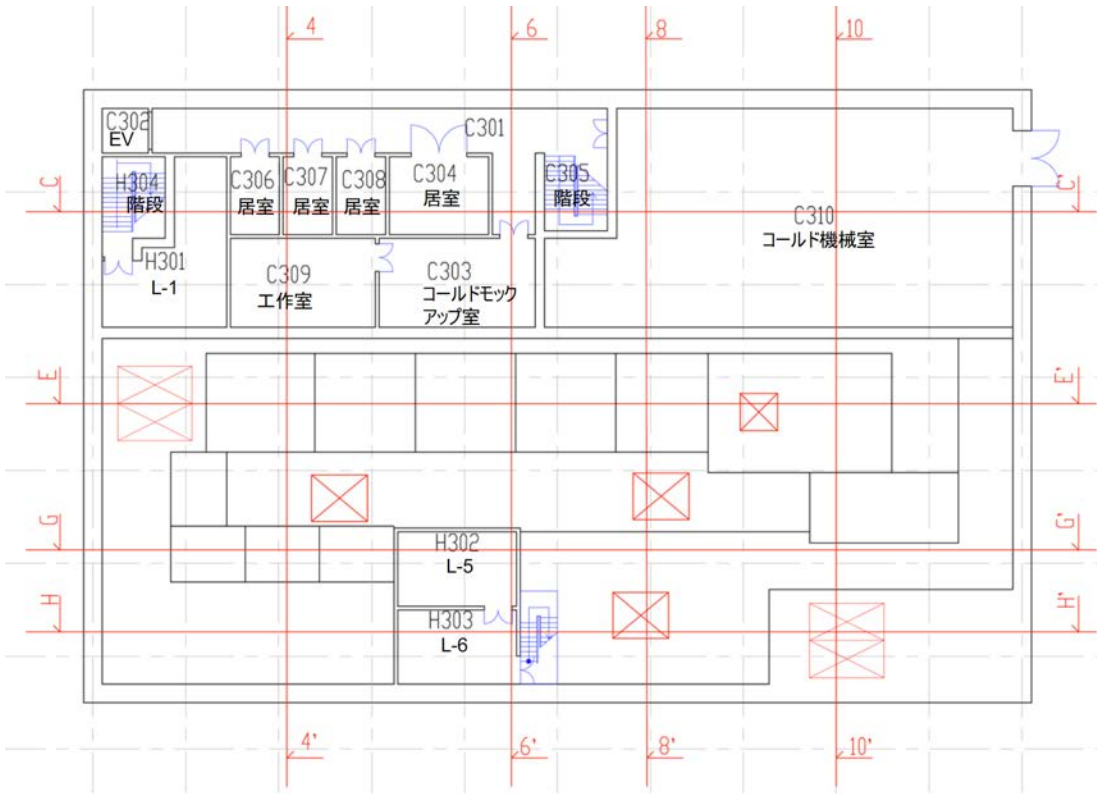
PIE facility floor plan (2nd floor).
